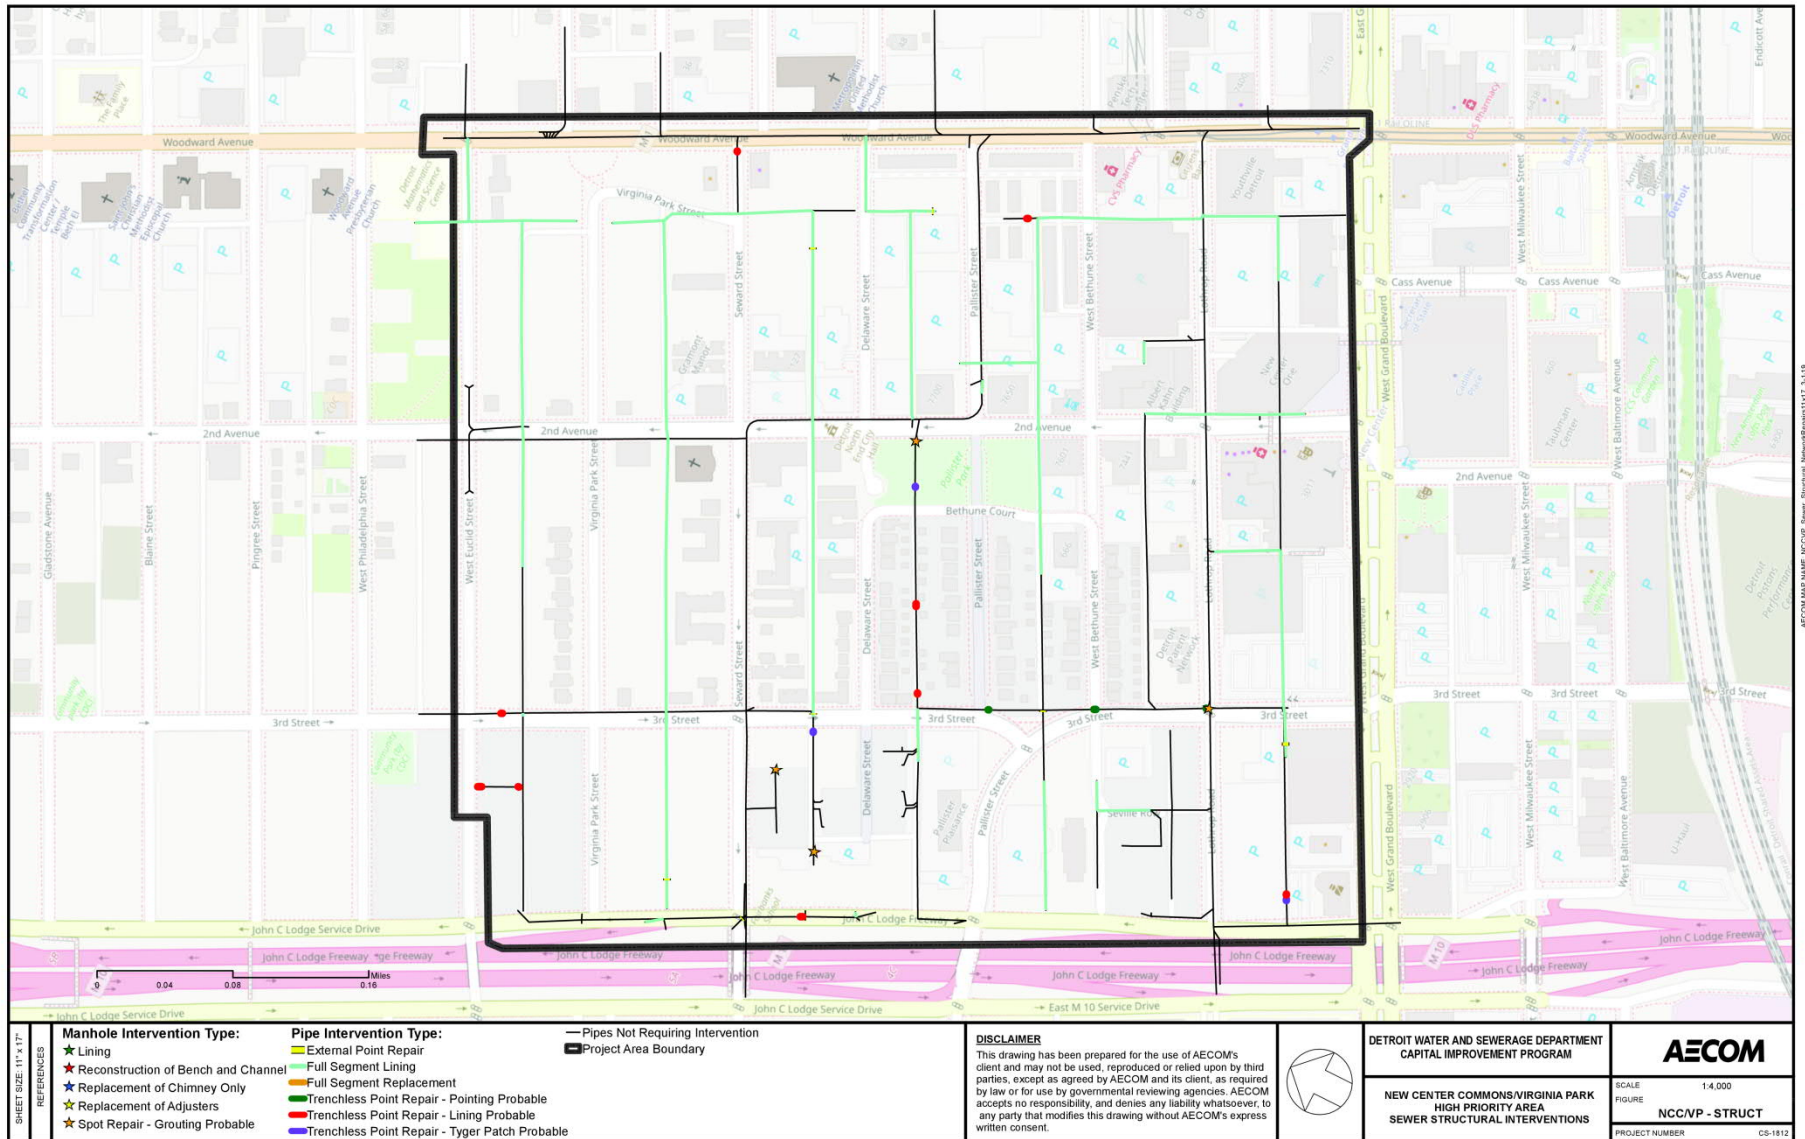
New Common Center/Virginia Park Sewer Structural Repairs
